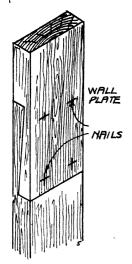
A JOINT IN A WALL PLATE SHOULD BE MADE AS SHOWN
